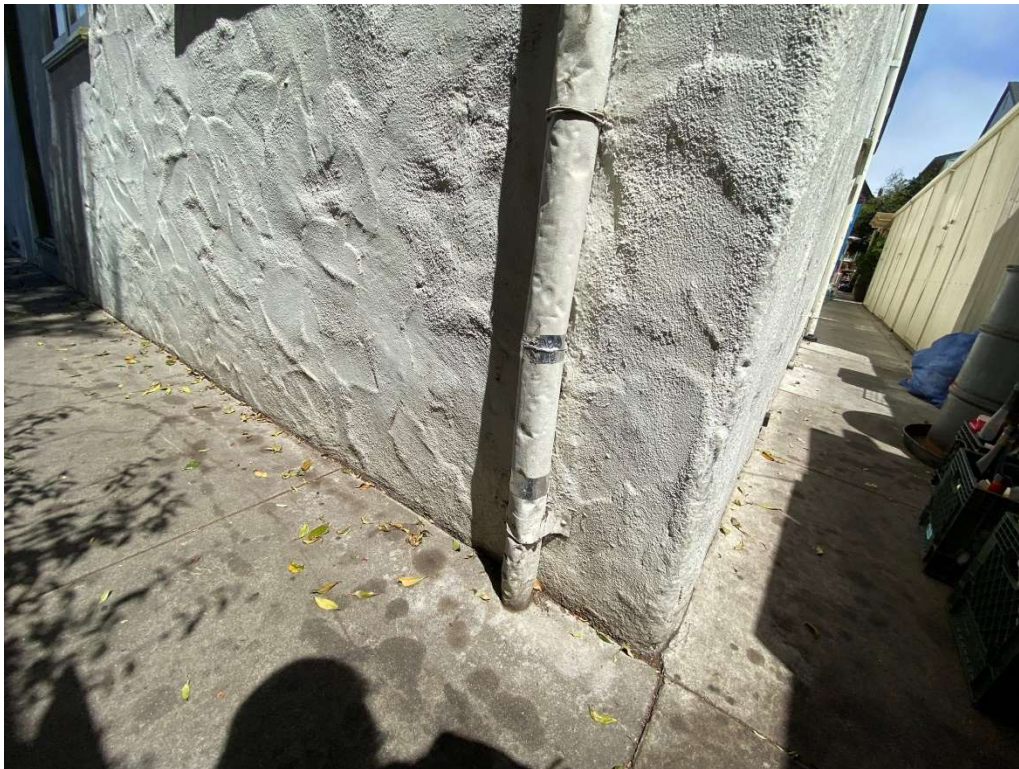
, damaged downspout (typical condition at perimeter)
